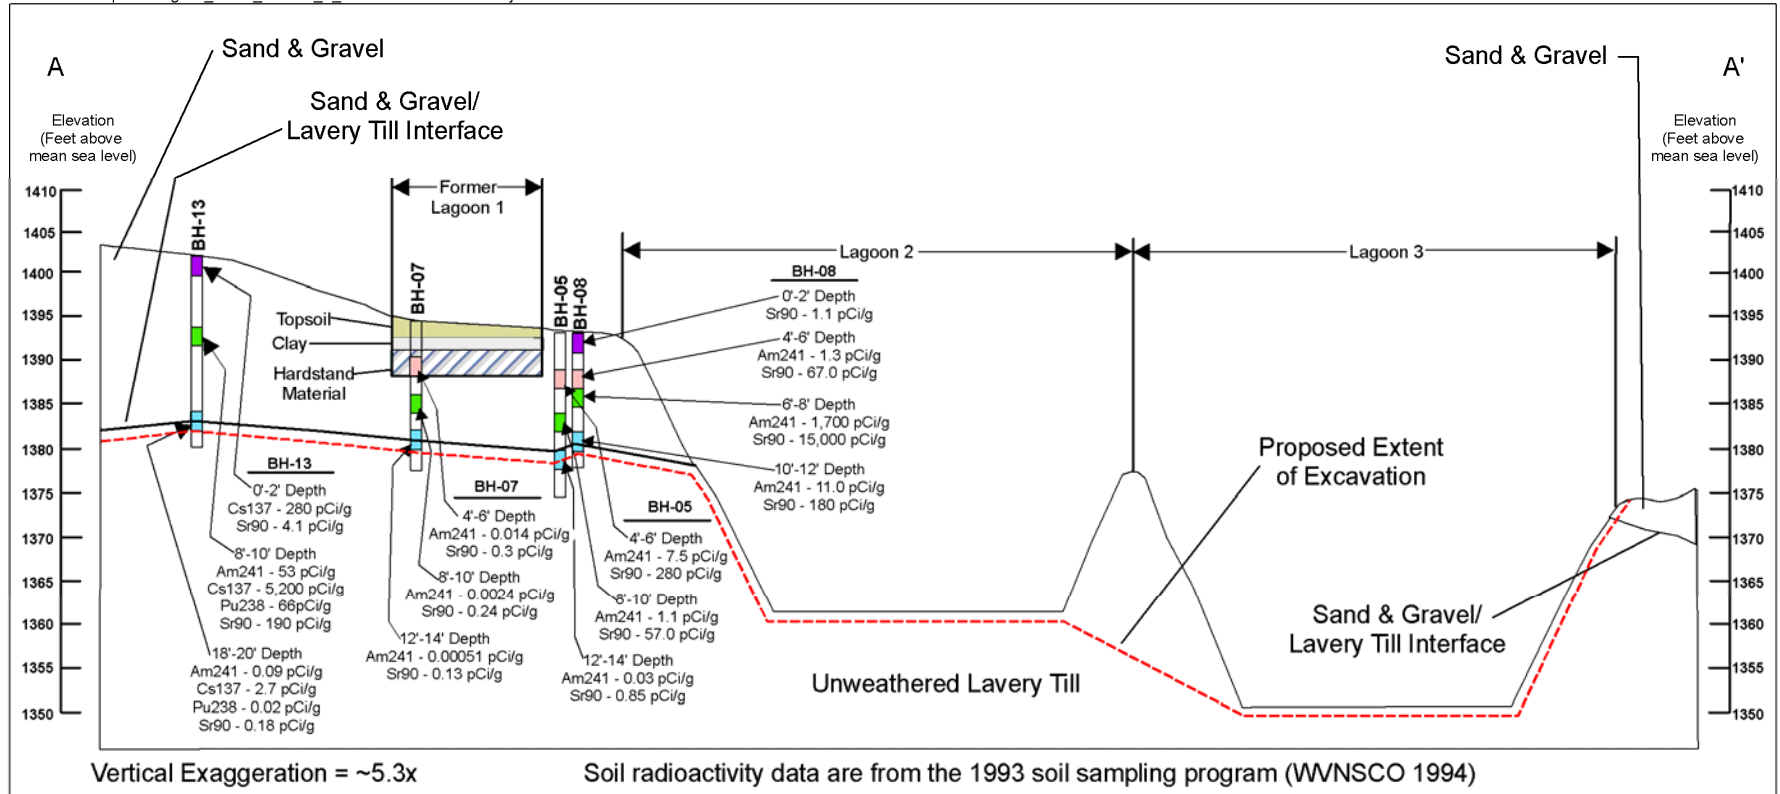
Conceptual Arrangement of WMA 2 Excavation, Cross Section
